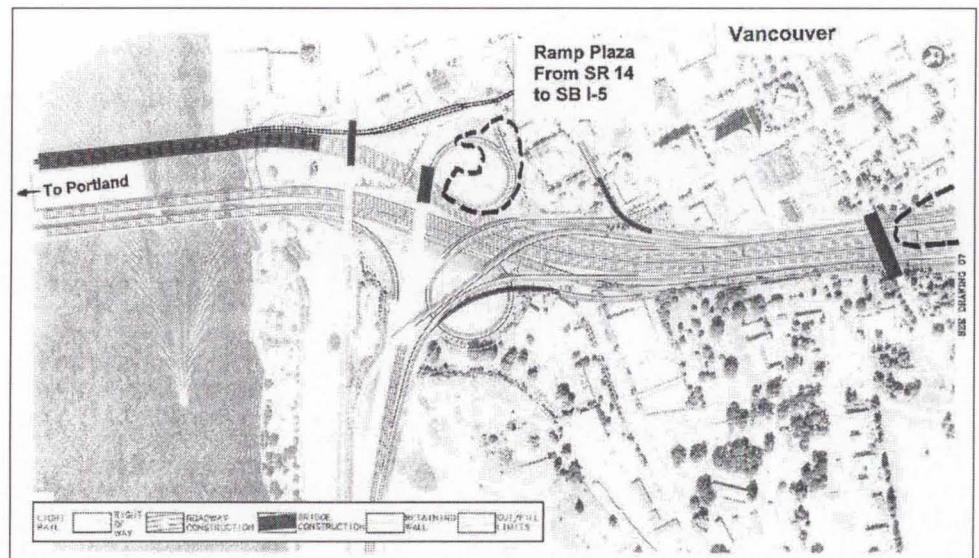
Ramp plaza from SR-14 to southbound I-5 for Toll Plaza Site #1.
